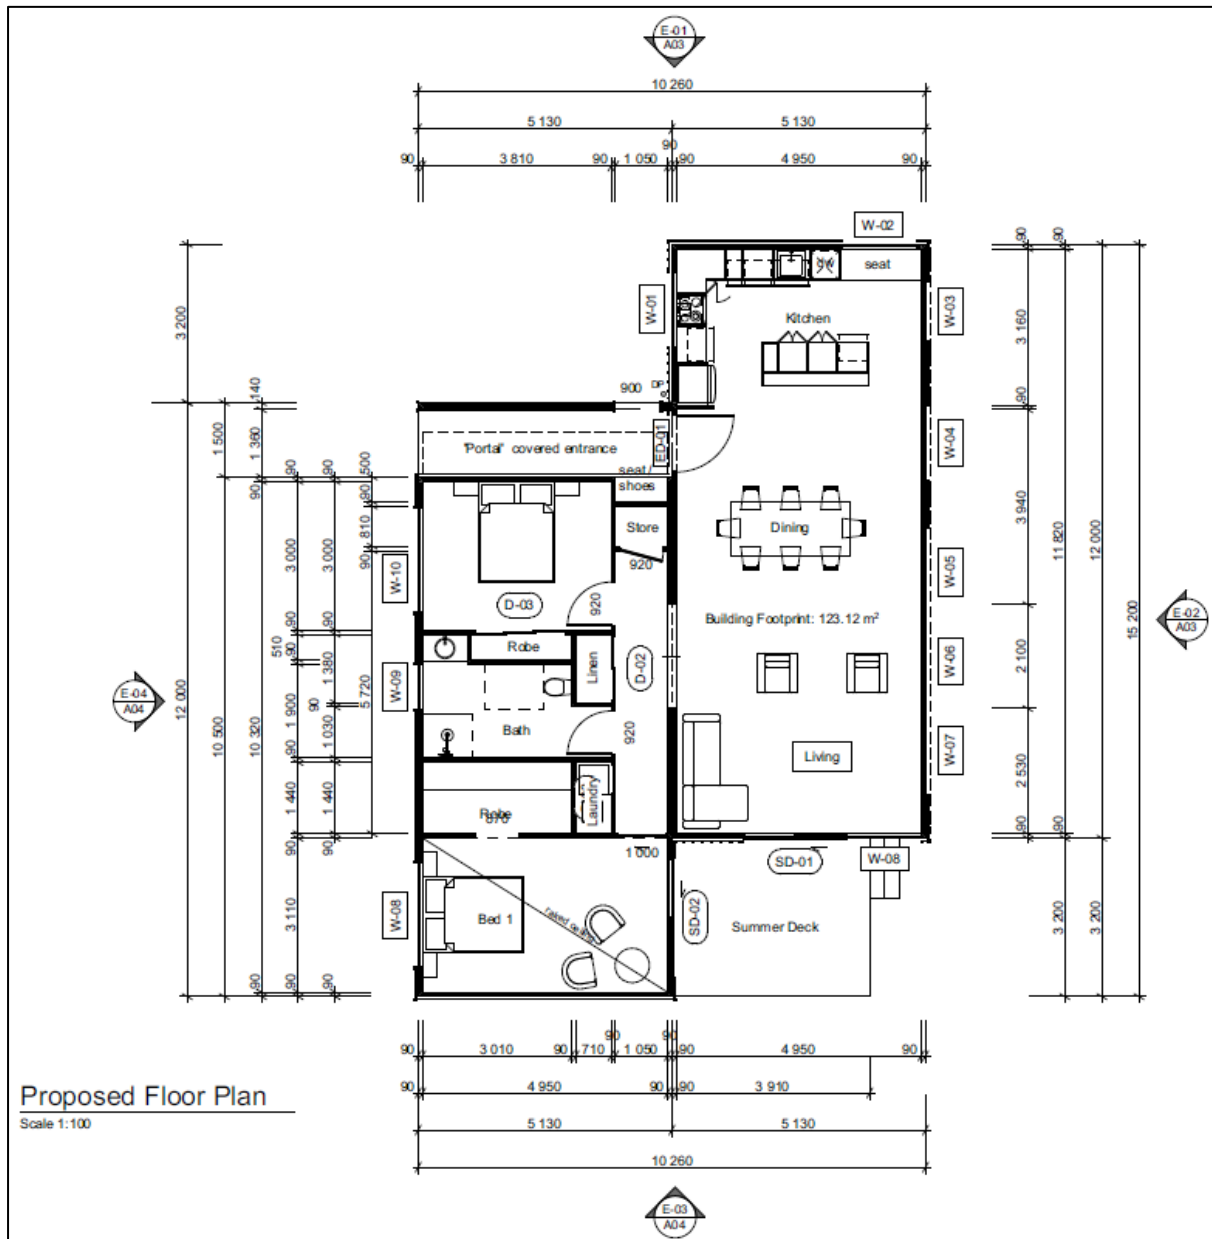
Floor Plan – New Dwelling (Source: Spectura Studio).
